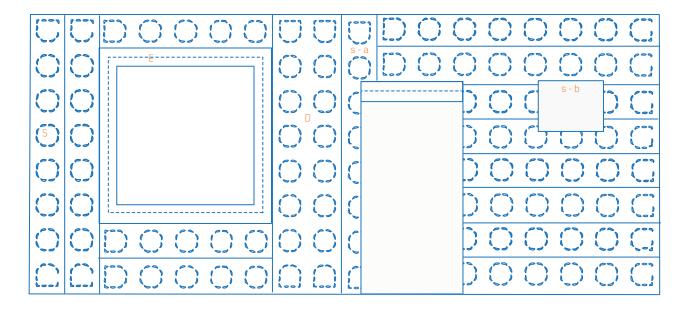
PLACEMENT OF REINFORCEMENT WITHIN THE WALL
